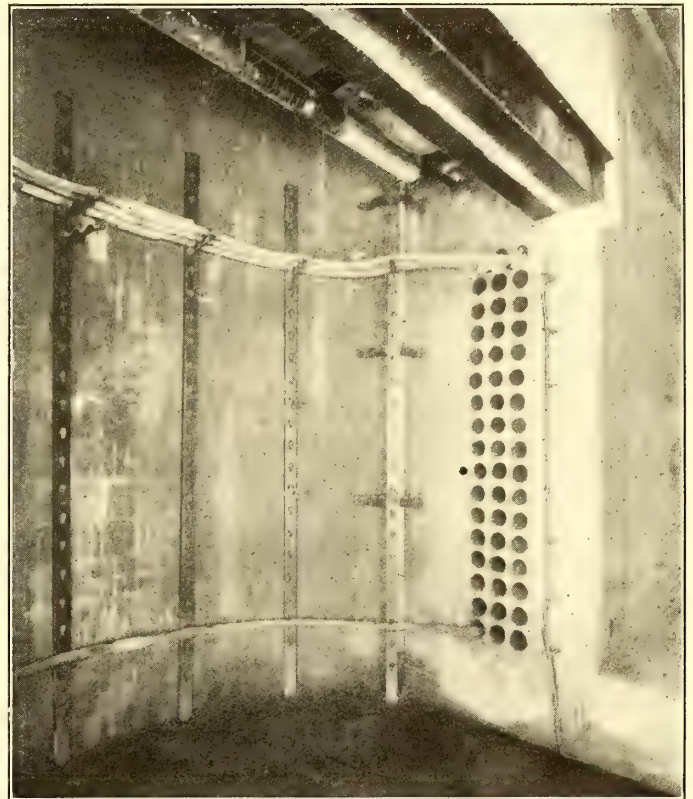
INTERIOR OF MANHOLE, SHOWING DESIRABLE ARRANGEMENT OF DUCTS
